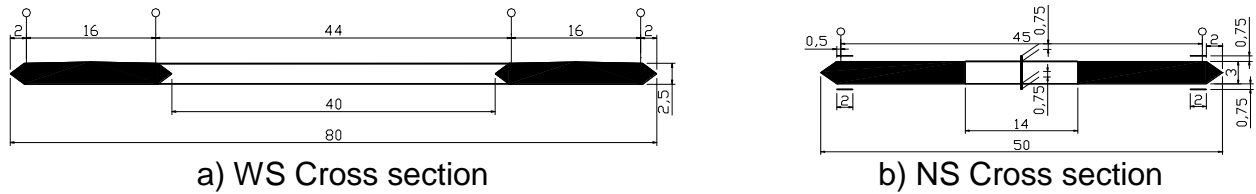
Geometry of deck sections of WS and NS (Unit: m)
